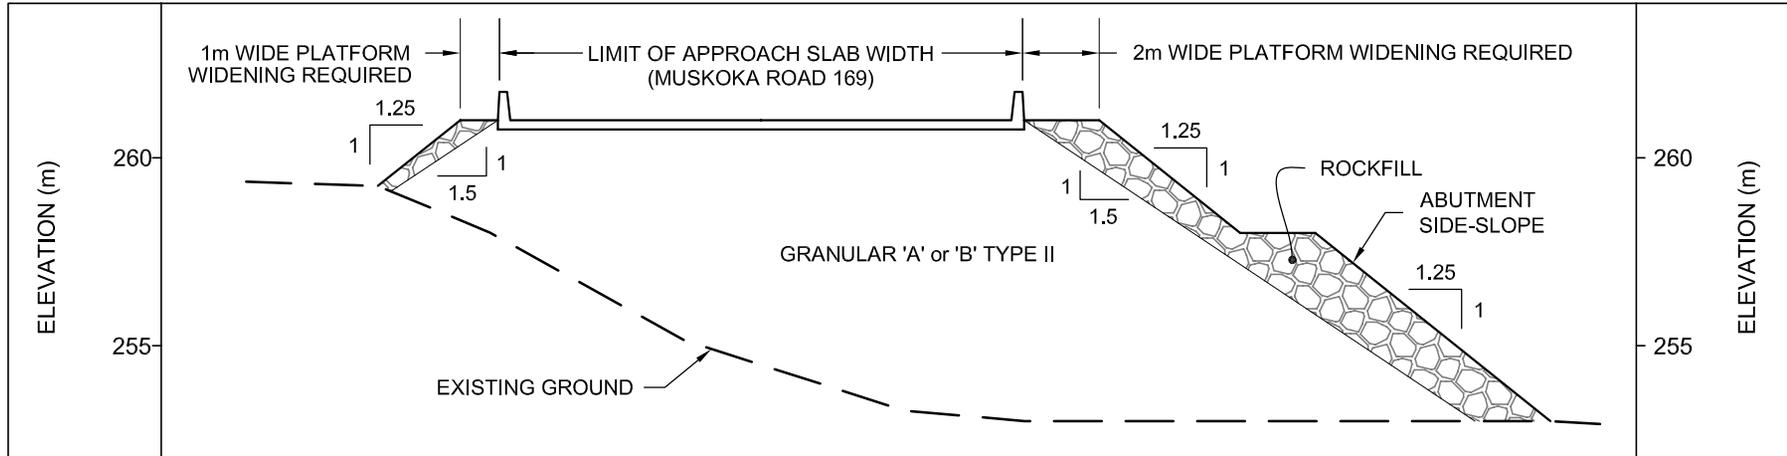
A - TYPICAL SECTION ACROSS APPROACH SLAB
